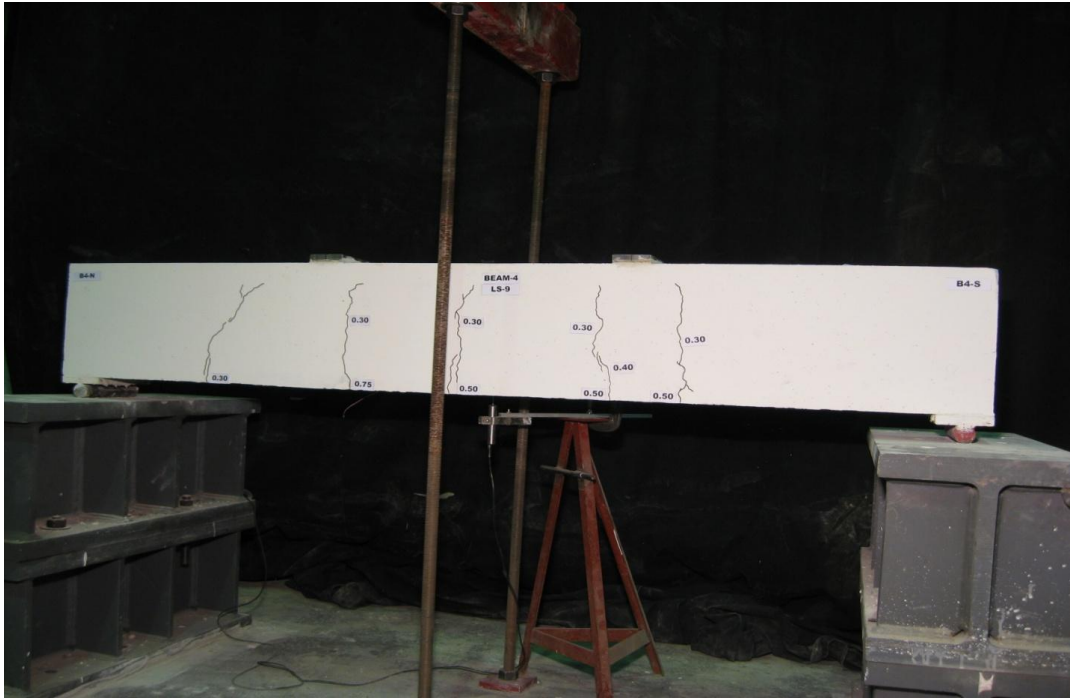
Cracking pattern for beam 4 at a load of 66.57 kN (B4-LS9)
